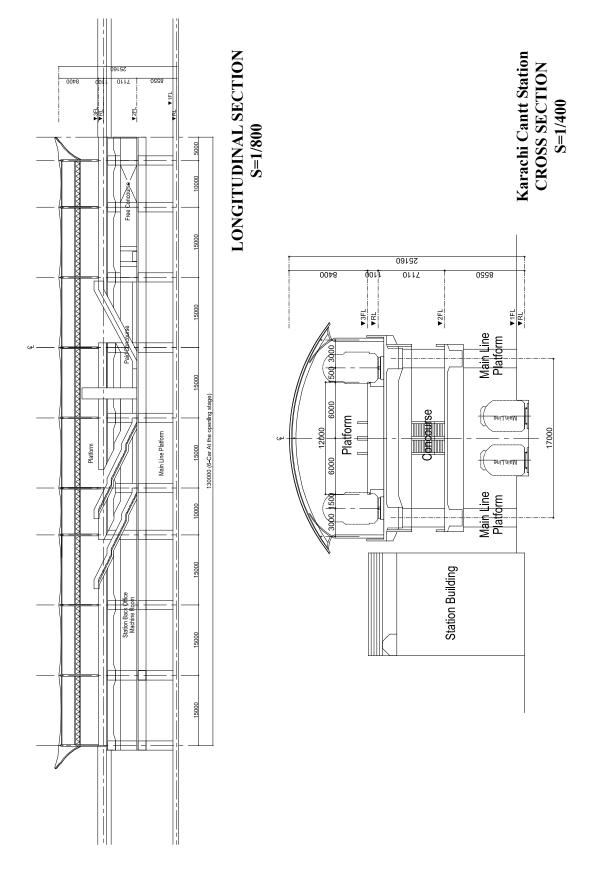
Station Architect Conceptual Plan (Karachi Cantt. Station)
